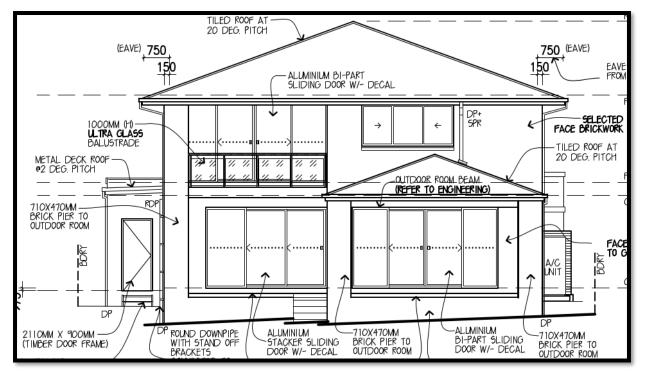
Proposed Elevation C (South-East elevation) window layout.
